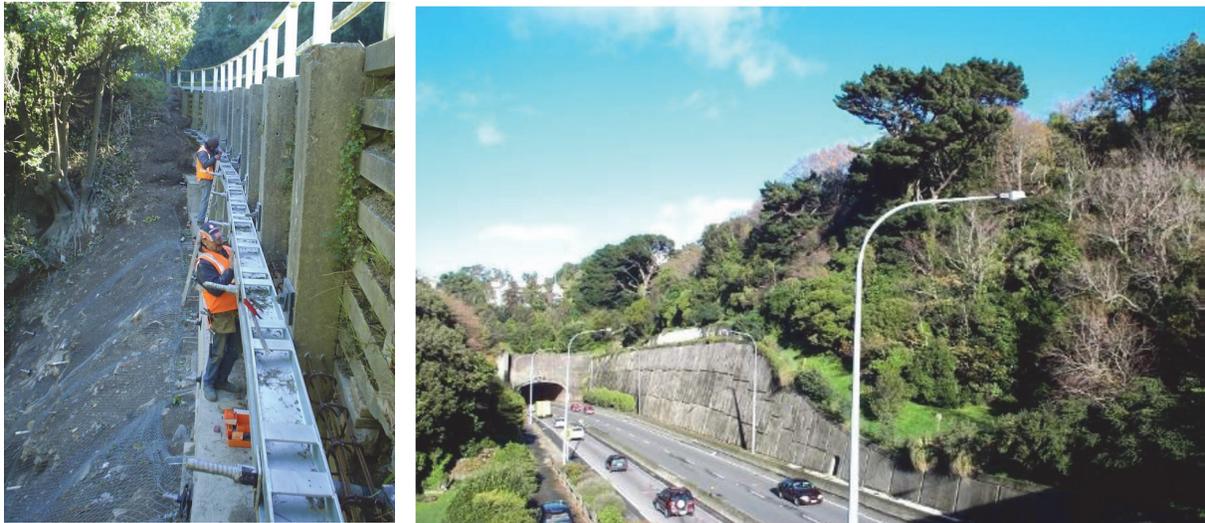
Strengthening of Ngaio Gorge retaining walls (left), Terrace tunnel approach walls (right).
